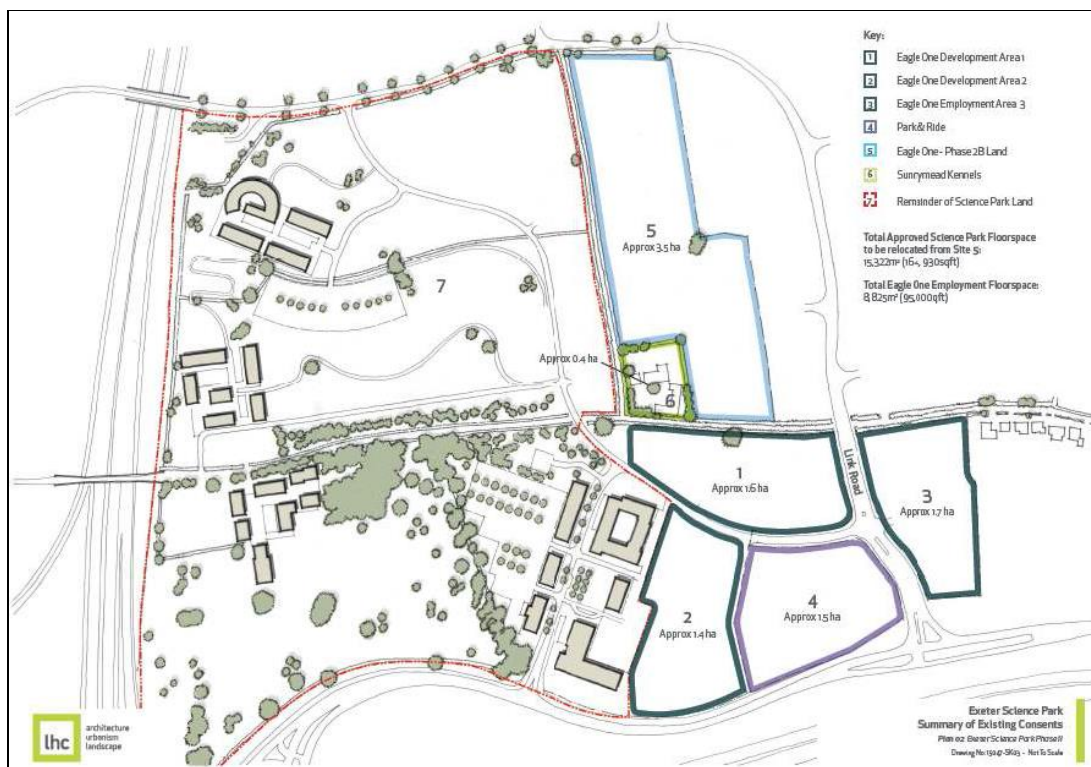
Plan Showing the Location of the Proposed Land Swap Parcels
